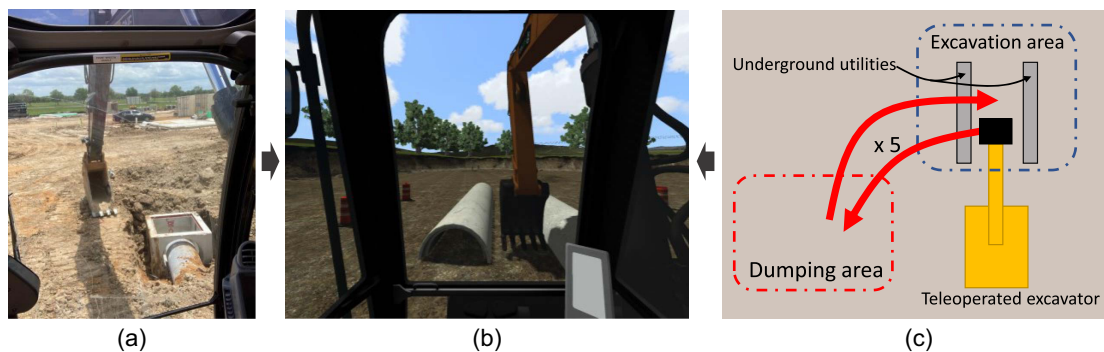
Excavation site design and task: (a) real excavation site; (b) virtual excavation site referencing real site; and (c) excavation task for the experiment.
